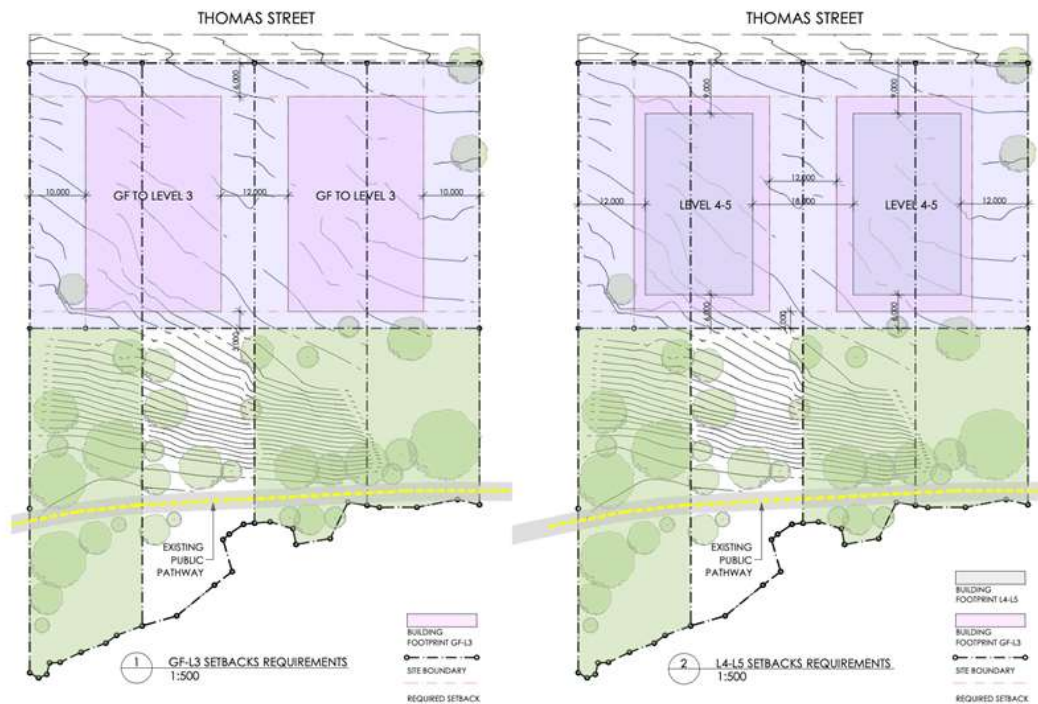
(a) Area 5 Indicative Building Envelopes
